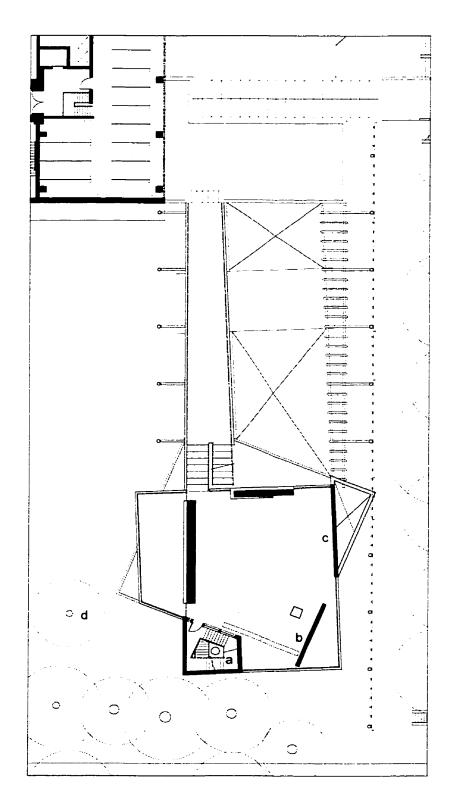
Second floor plan. The chapel space is clearly a strongly enclosed space. Its heavy concrete walls block outside noise, and frame a series of controlled views of tree tops and sky.
